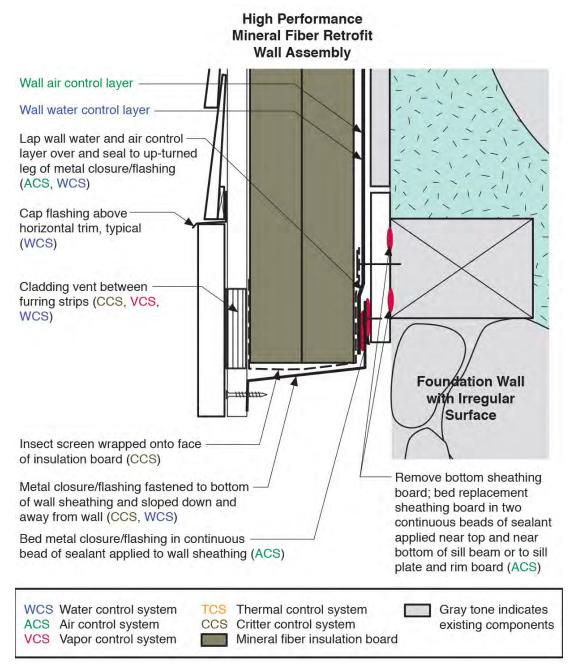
Schematic detail for transition from a high performance mineral fiber retrofit wall assembly to a bumpy-surface foundation wall
